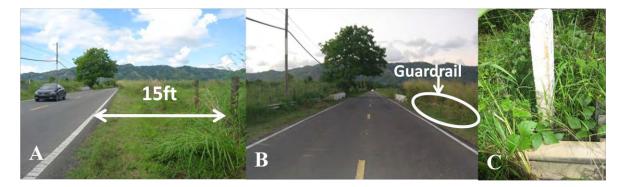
Issues Encountered on Bridge #63 Northbound Approach
